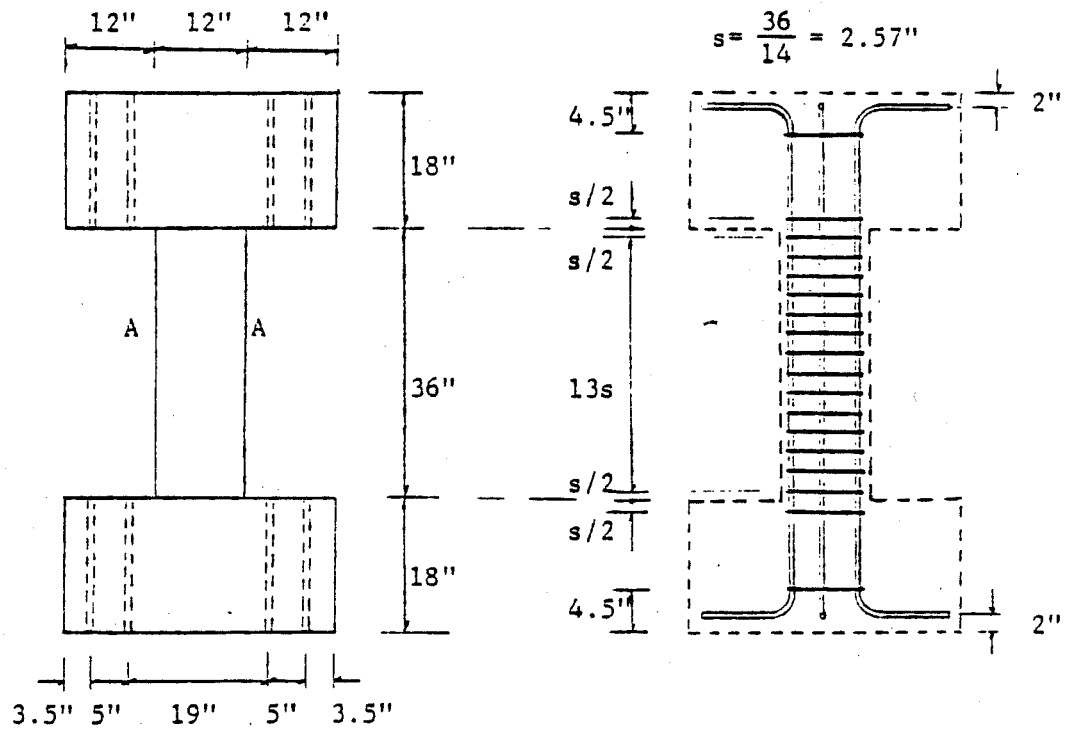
Maruyama and Ramirez test specimen [15]
